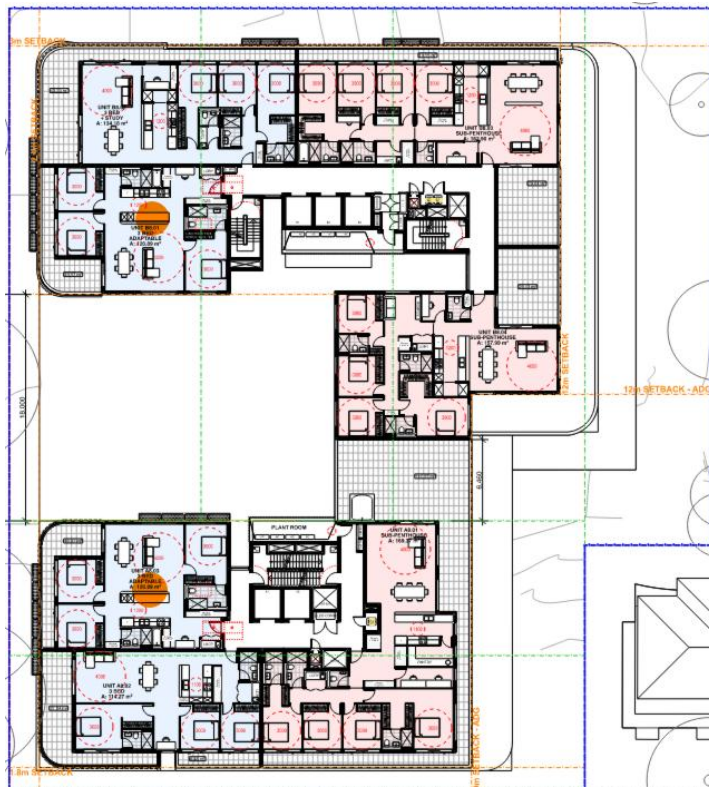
Eighth Floor Adaptable Unit Location on Architectural Plans
